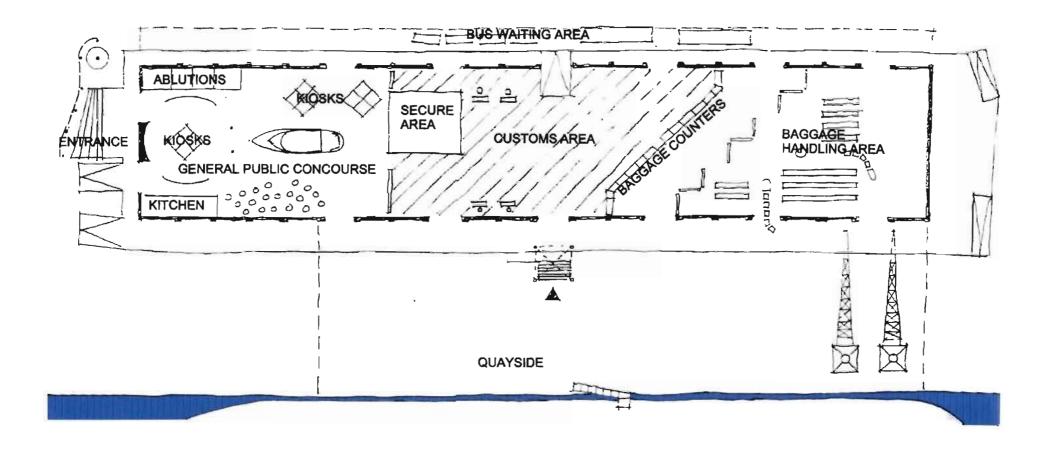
Floor plan of N-Shed Passenger Terminal. (*Protekon.* 1993: 6)
